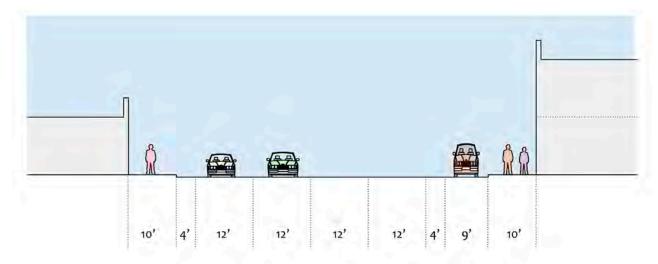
Street dimensions of Evans Avenue cross-section.
